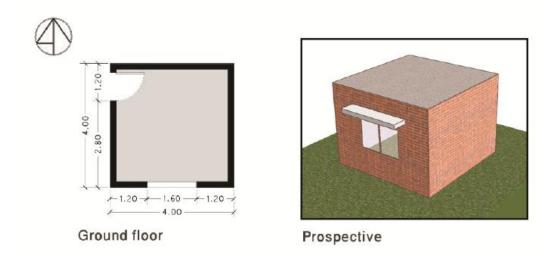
Ground Floor and Perspective View of Room Model [27]
